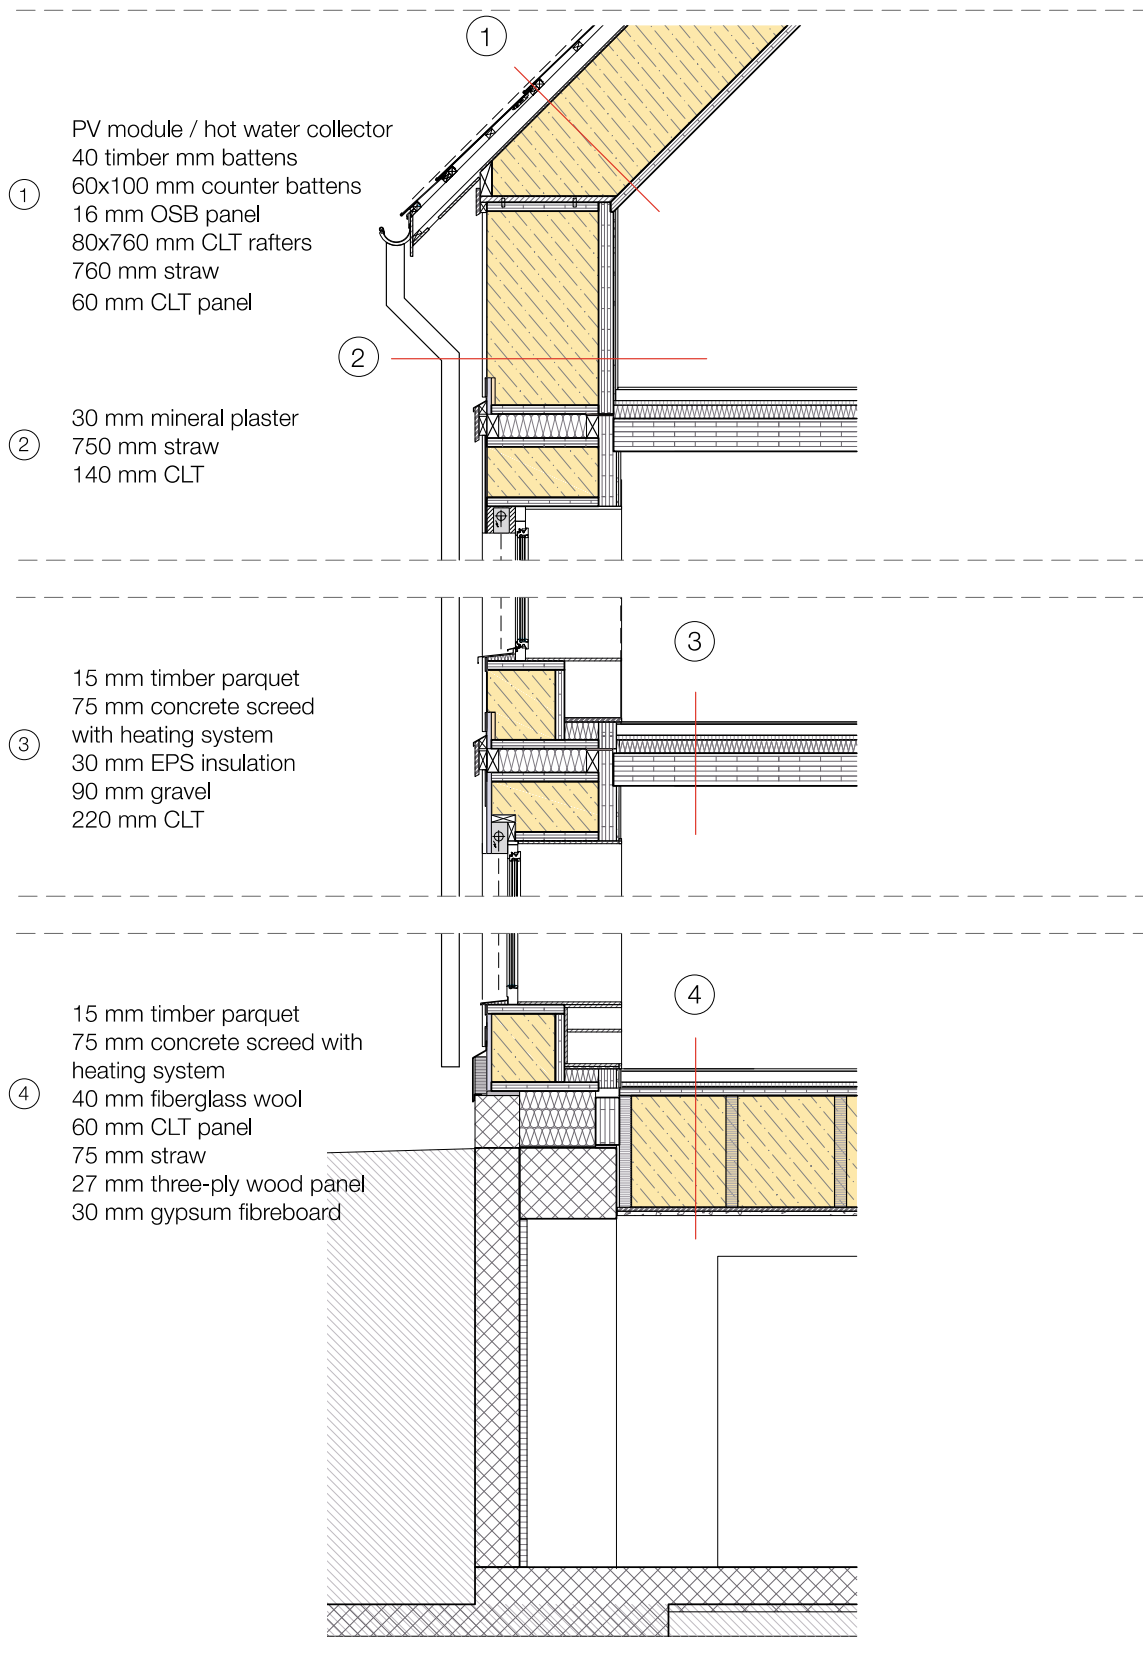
Section of Bombasei external wall. Scale 1:50. Source: Atelier Werner Schmidt.
